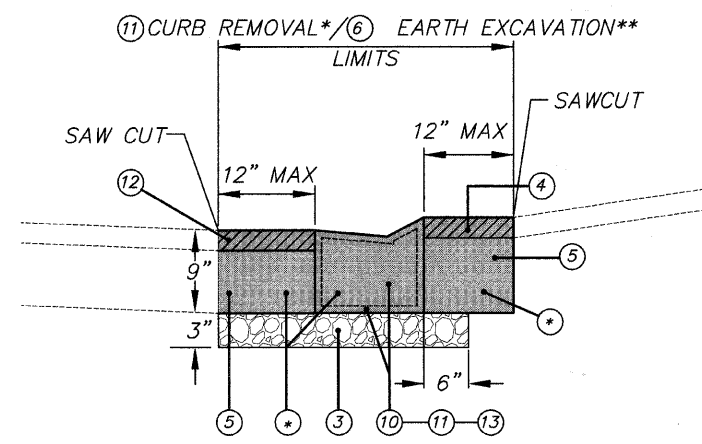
DETAIL SECTION SHOWN IS THROUGH DRIVEWAY FOR SIDEWALK THROUGH TURF REPLACE (4) & (5) WITH (9)
